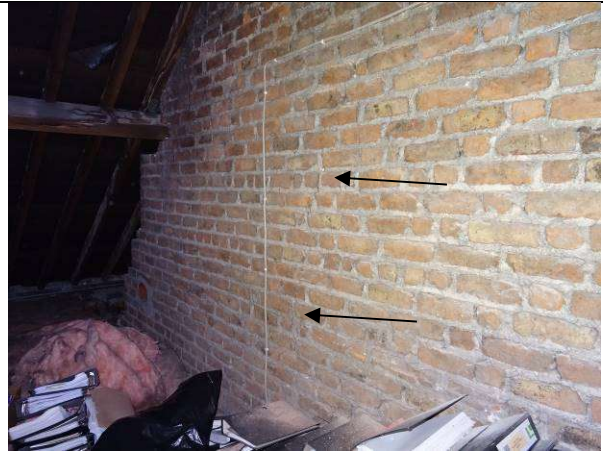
Narrow vertical crack to joints of eastern face of eastern chimneybreast.
